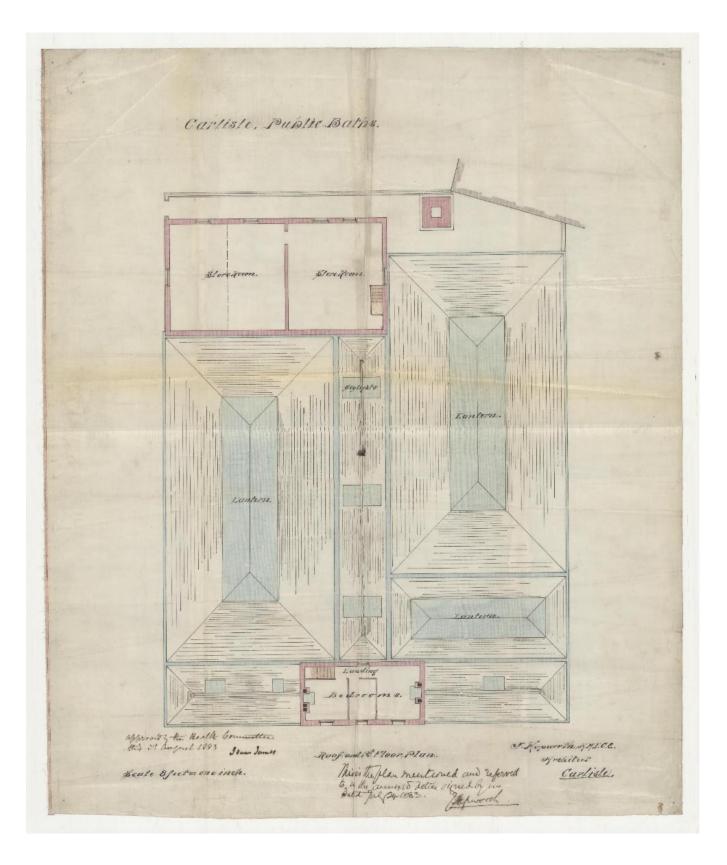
Above: Public Baths First Floor & Roof Plan 1883 (Cumbria Archives)
